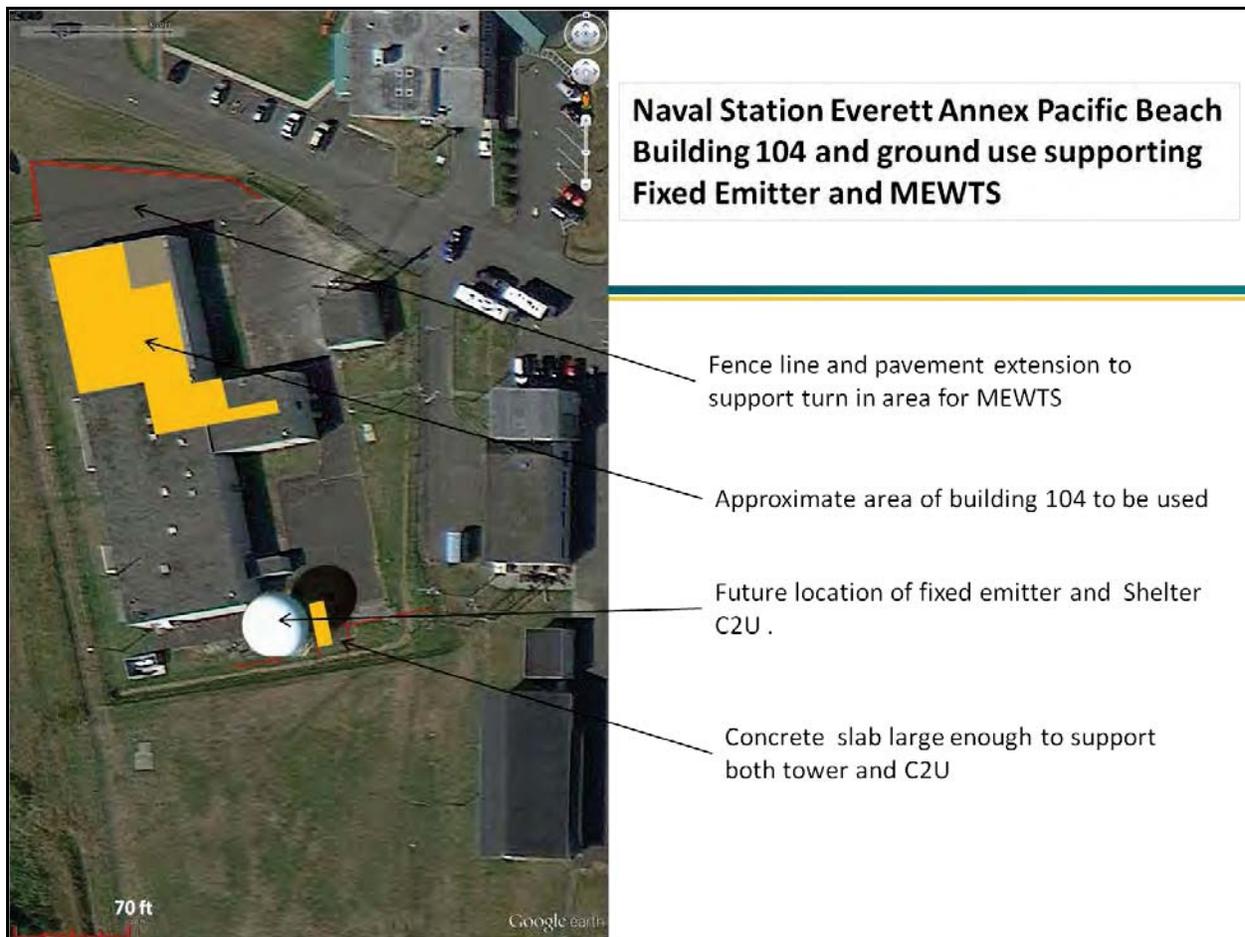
Proposed Fixed Emitter Location and Renovations to Building 104 Site
